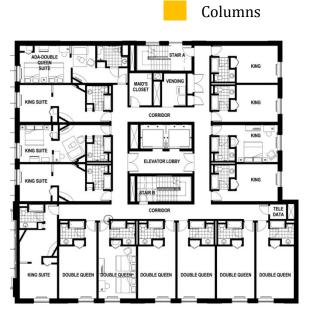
Third thru Tenth Floor Architectural Plans
